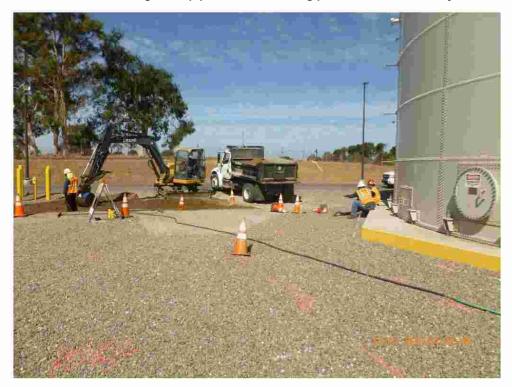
Excavation of relief trenches and foundation pad for the fire pump on September 14, 2018.
